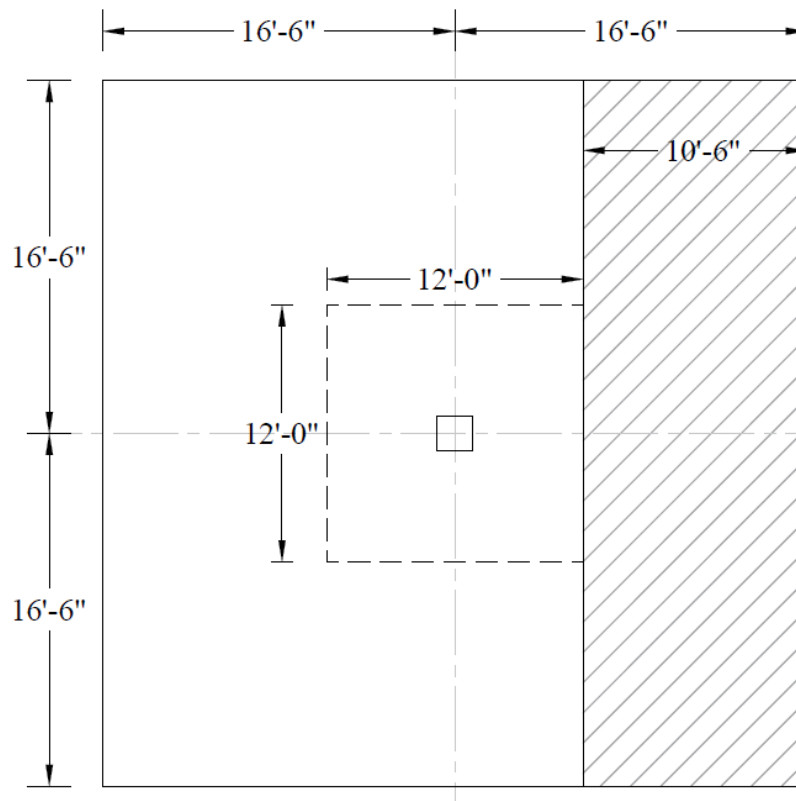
Critical Section at the Face of the Drop Panel for One-Way Shear
